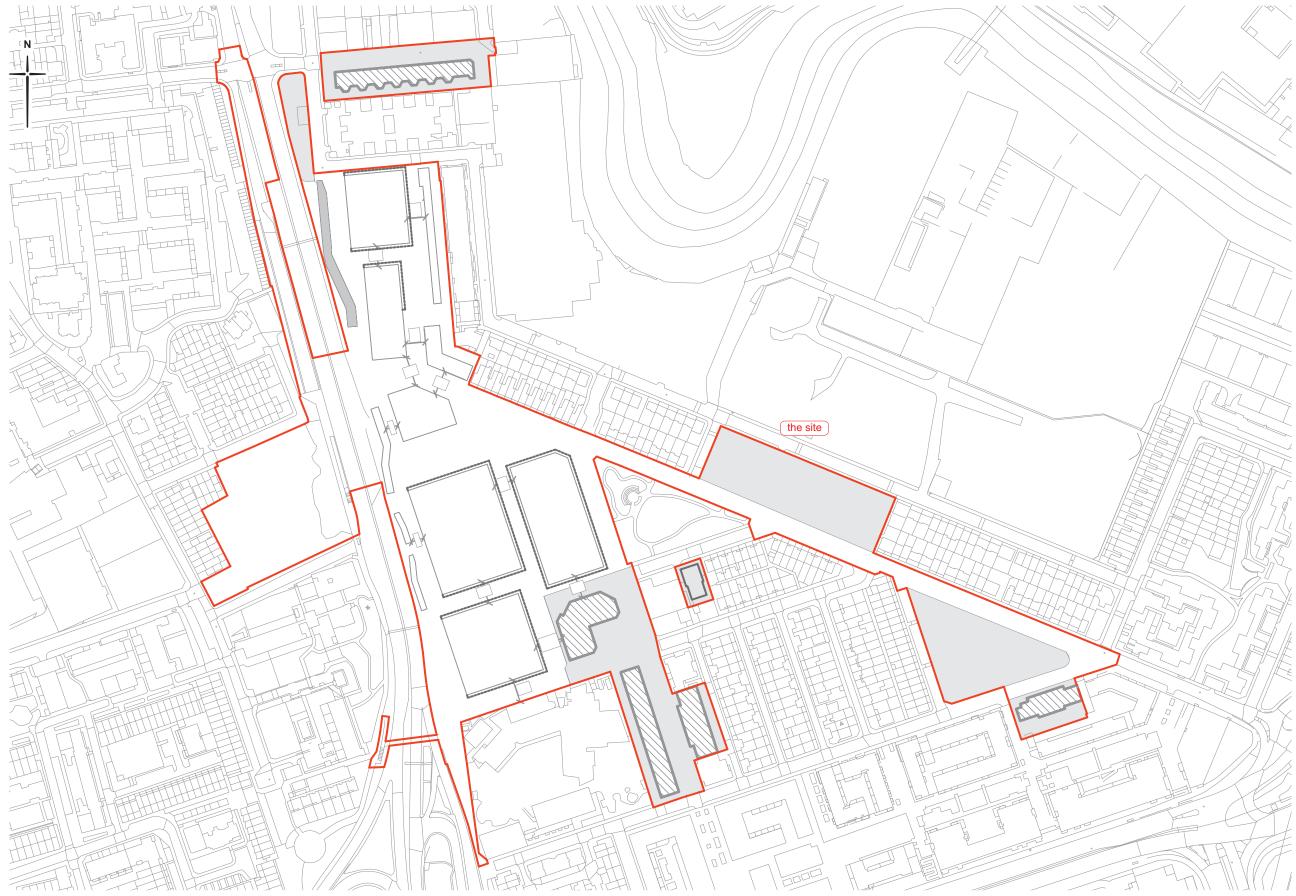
Outline Plan of Proposed Development (Levitt Bernstein proj. no. 3663-LB-ZZ-00-DR-A-000021, Rev 1, 16/03/22)
